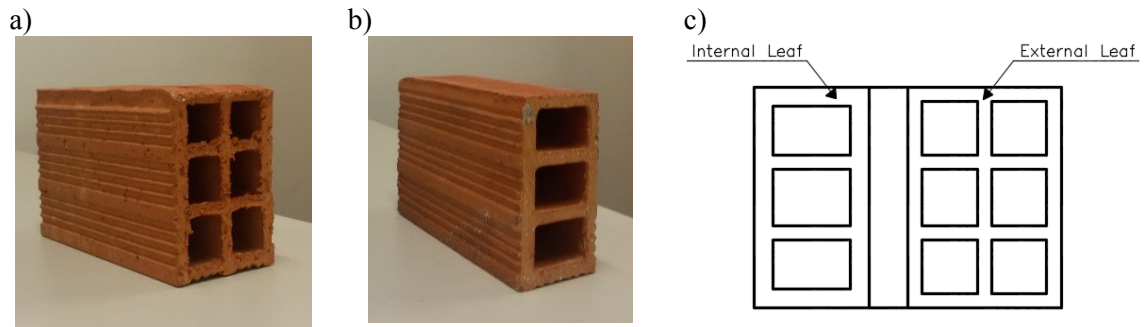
Brick units and cross section of reduced scale masonry infill: a) bricks of 80mm thickness used in exterior leaf ; b) bricks of 60mm thickness used in interior leaf of the infill; c) cross-section of the infill in reduced scale specimens
